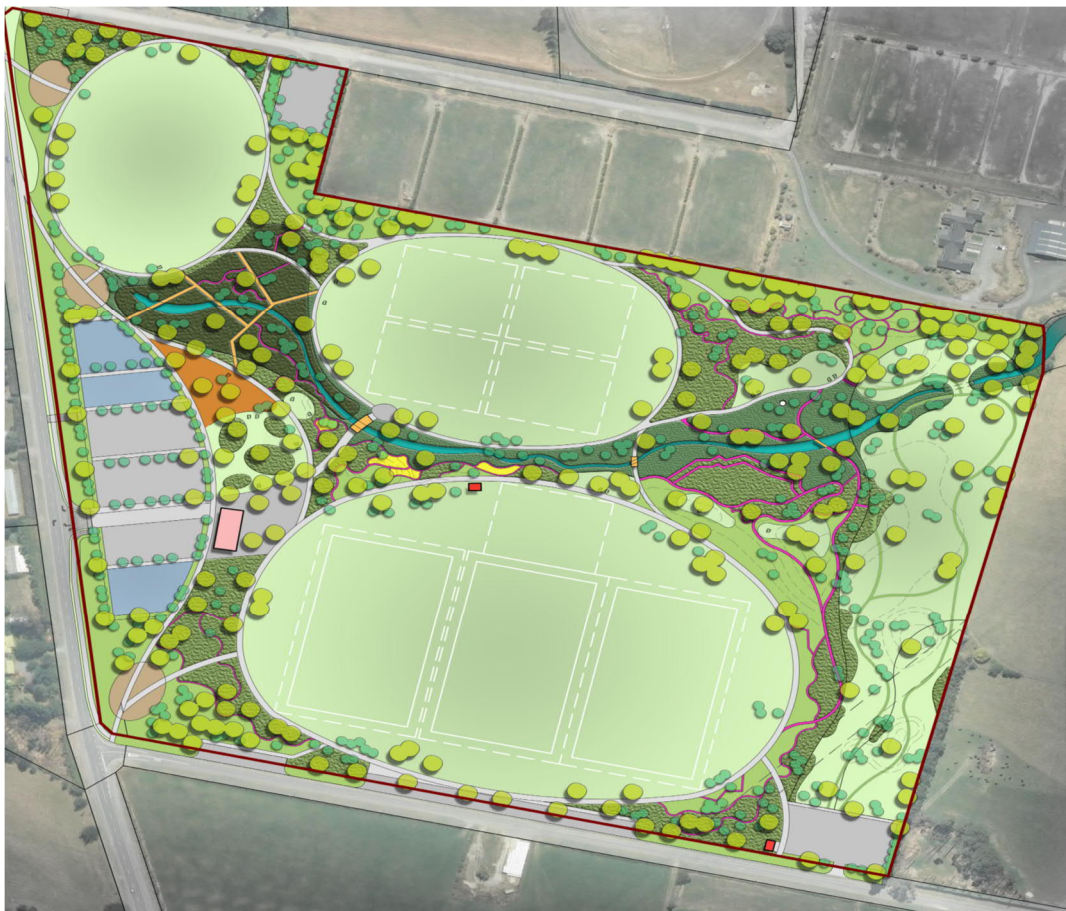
SDC Proposed Birchs Road Reserve Masterplan
